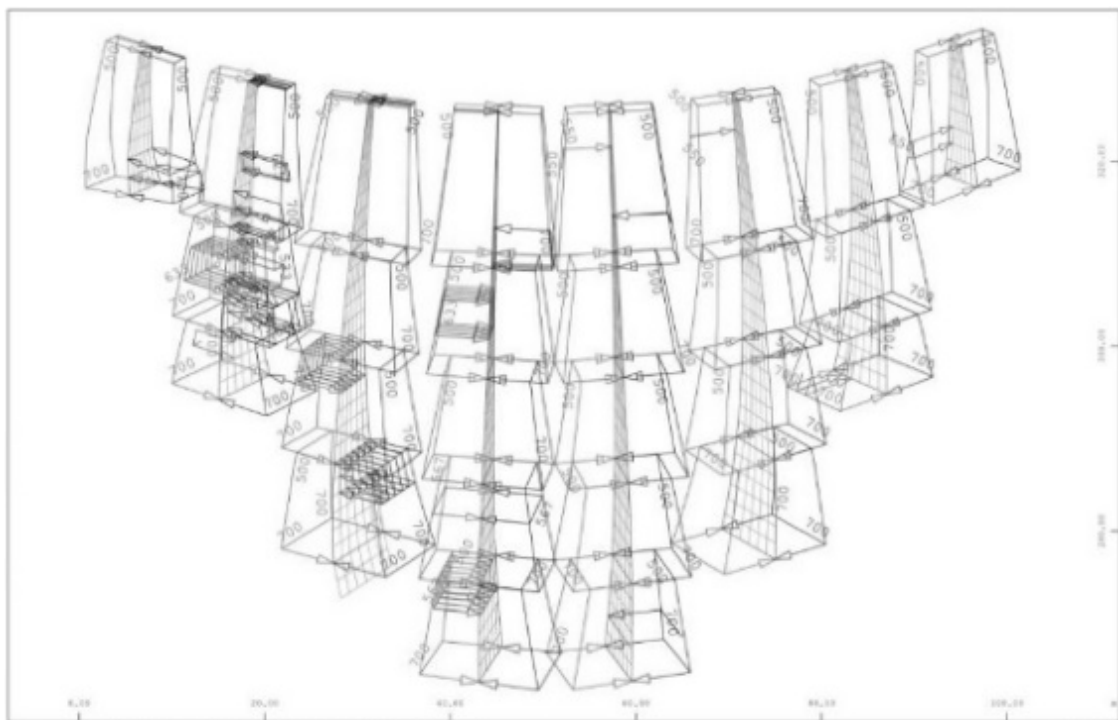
Grouting load, applied along surface of both sides of the dam joint
